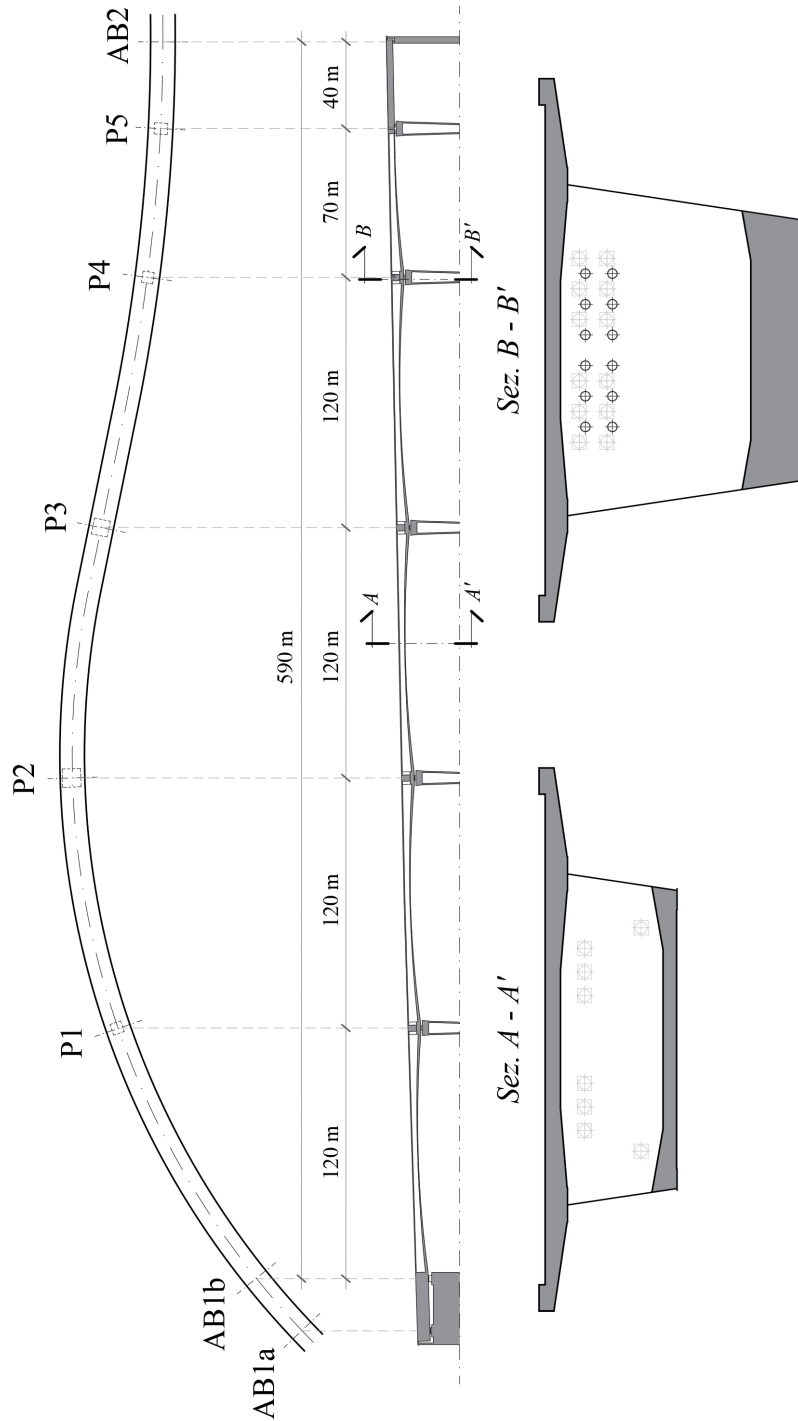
Structural details of the bridge: plan view, elevation and two different cross-sections (at the bearings and on the centerline of the span).
